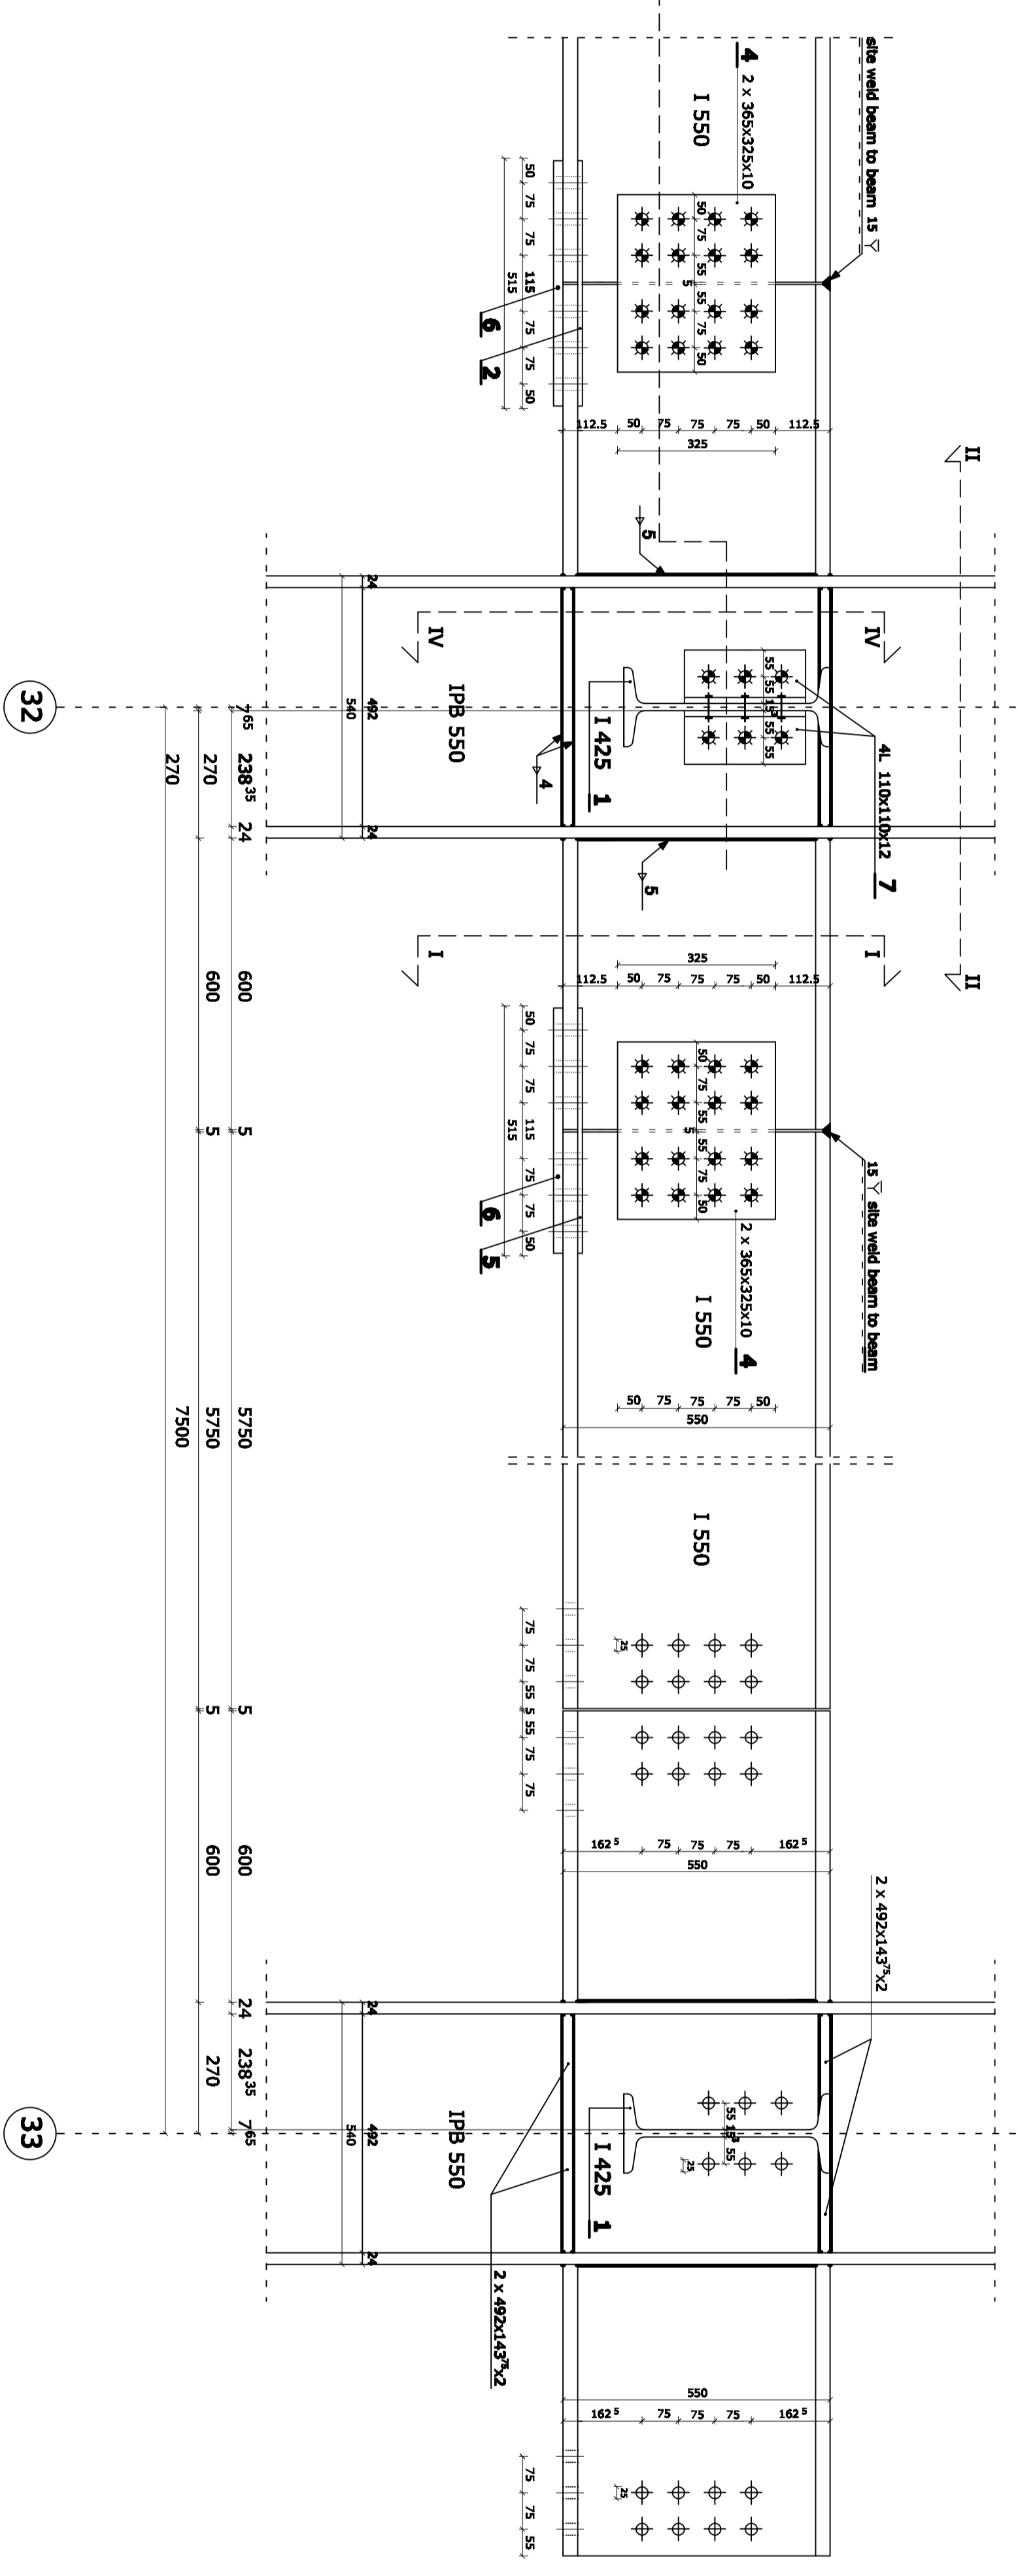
CONNECTION - PREFABRICATED ELEMENT 1 TO PRIMARY BEAM 1:10
